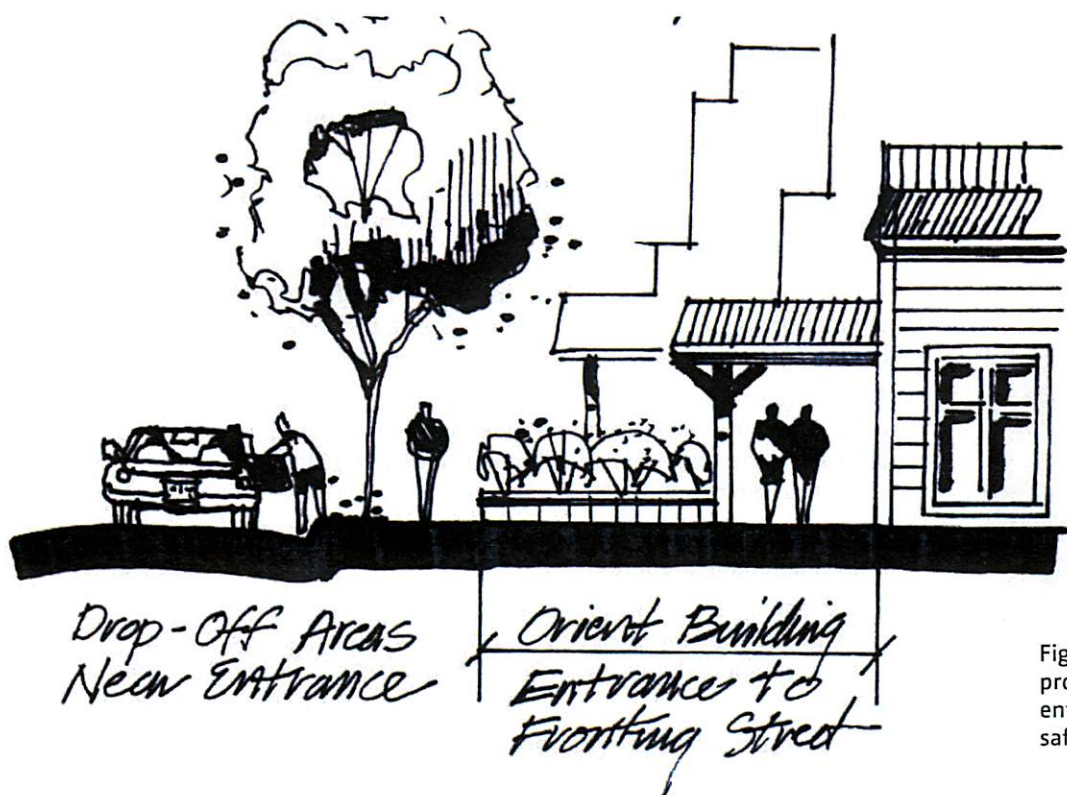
The building design shall provide unobstructed views to the entrance doors from the street for safety and security.
